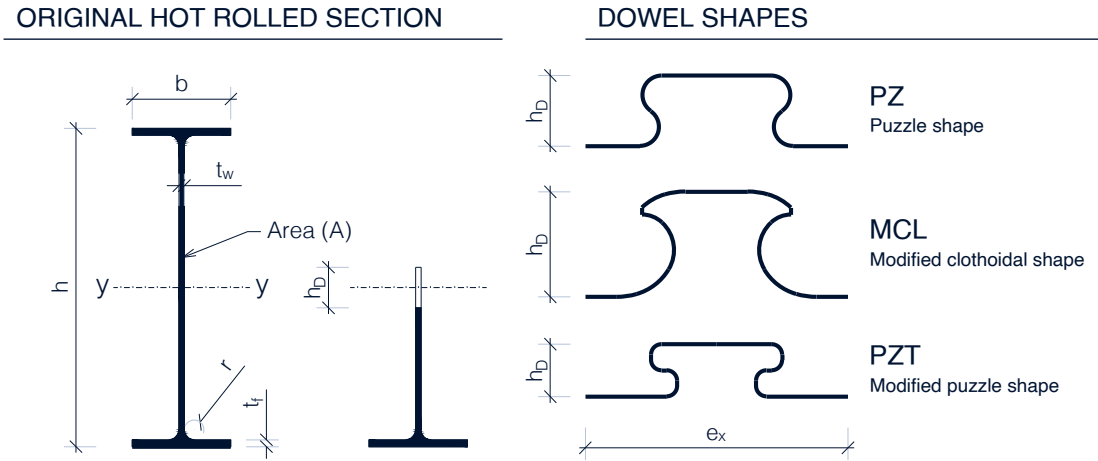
standard hot rolled section, single T cutted profile and steel dowel relevant dimensions and shapes
